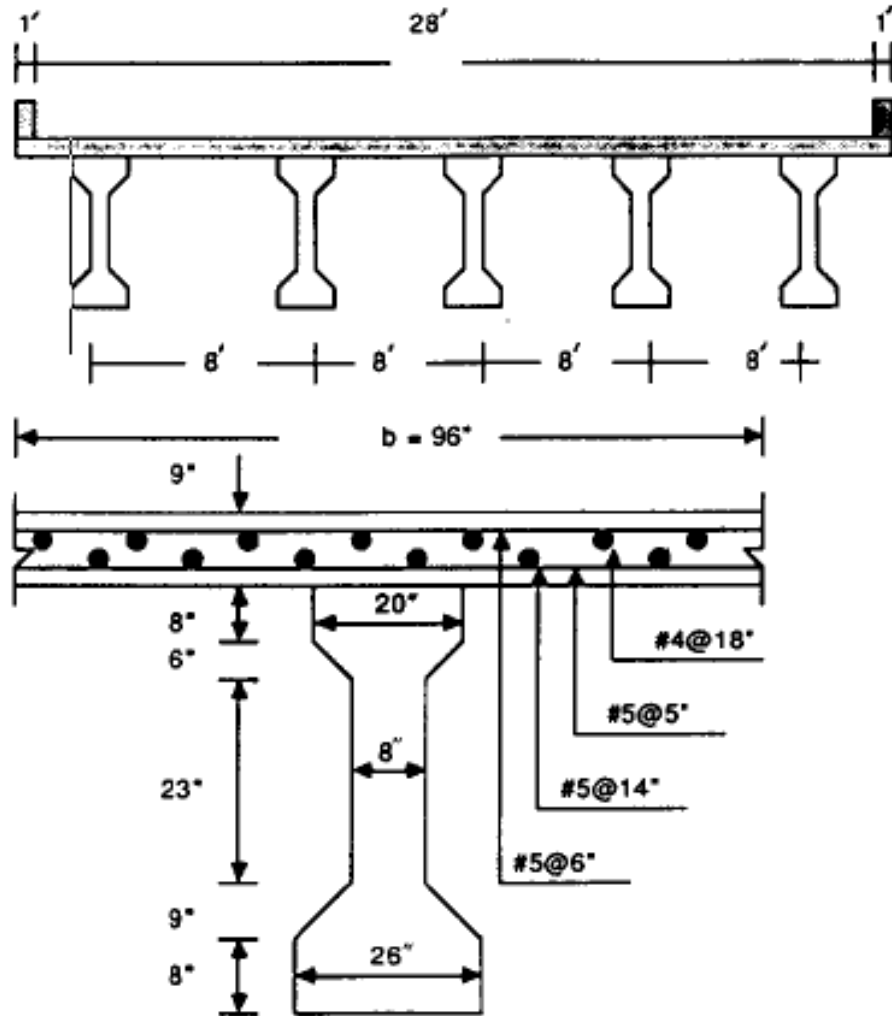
Prestressed girder bridge considered (Nowak and Zhou 1990)
